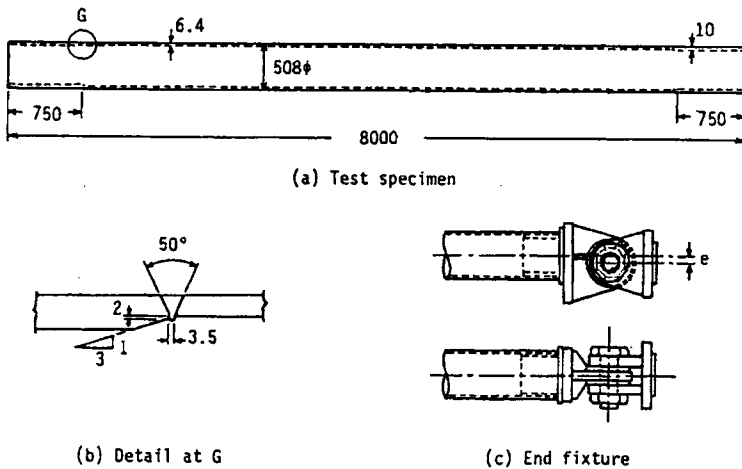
Large Scale Test Specimen and Its End Fixture
